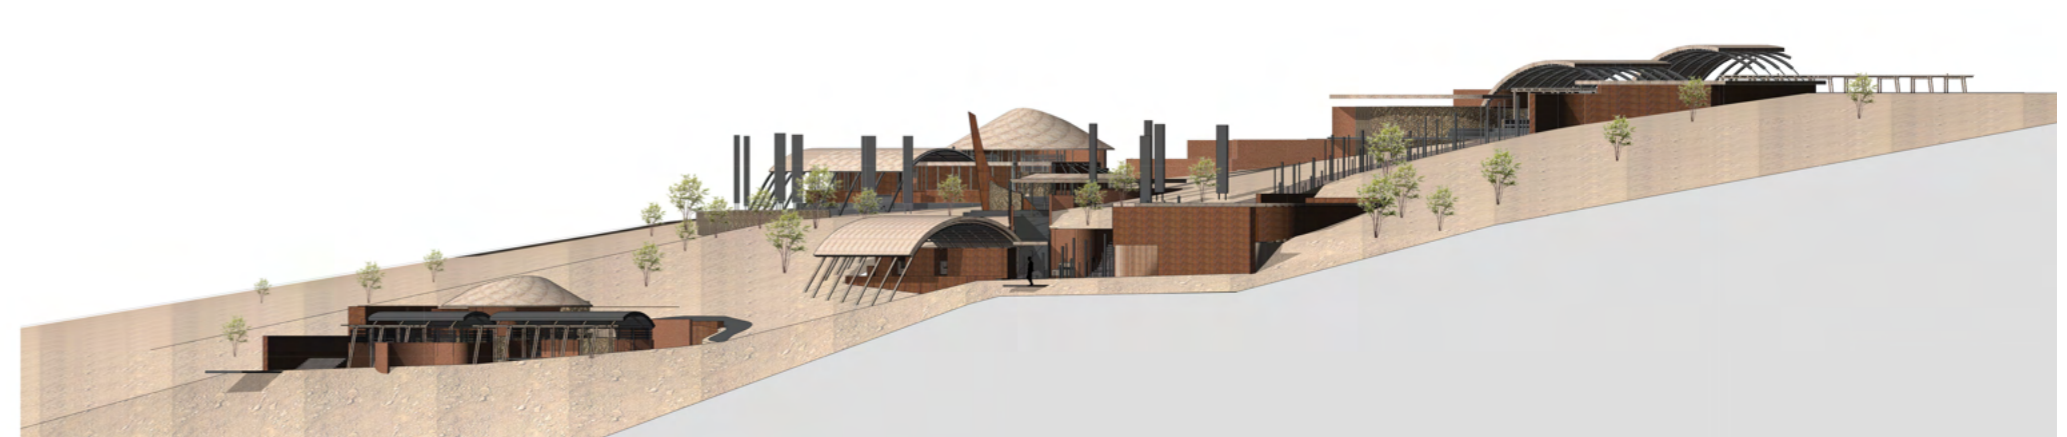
Design proposal 3 West elevation (Author, 2021)
